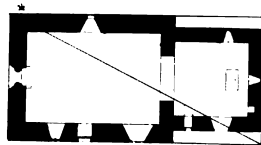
Church of Dale in Sogn. Plan, analysis.
